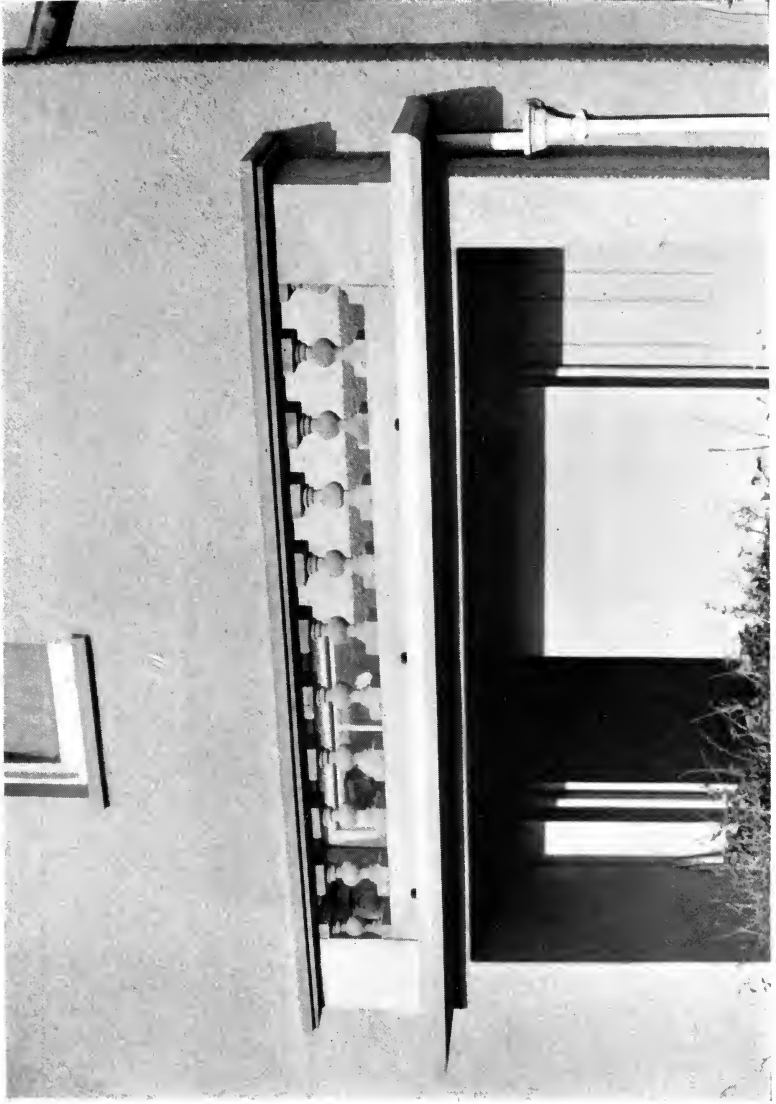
BALCONY BETWEEN TWO DOORS (10-foot span).
